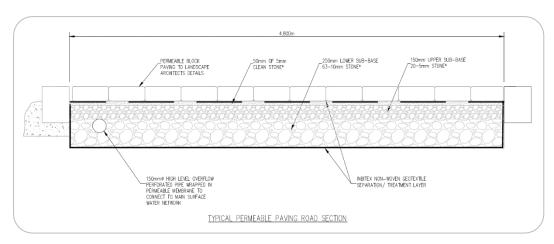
Proposed permeable paving cross-section (extract of CS Consulting drawing H081-CSC-XX-RF-DR-C-0021)
